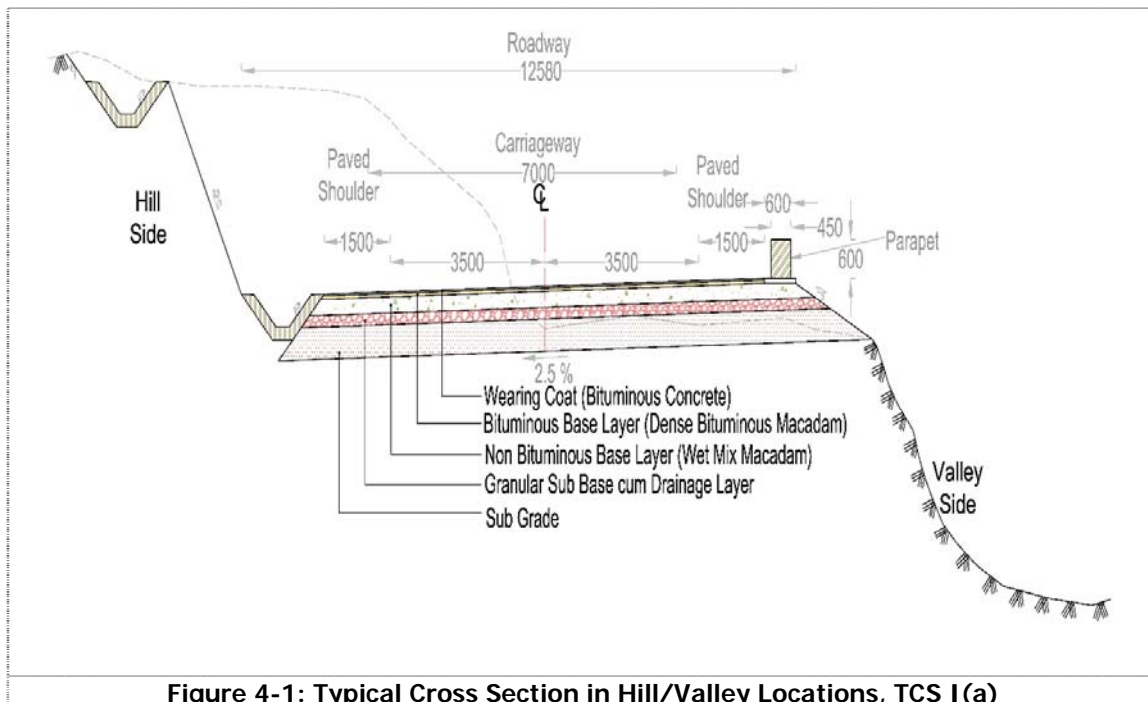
Typical Cross Section in Hill/Valley Locations, TCS I(a)
